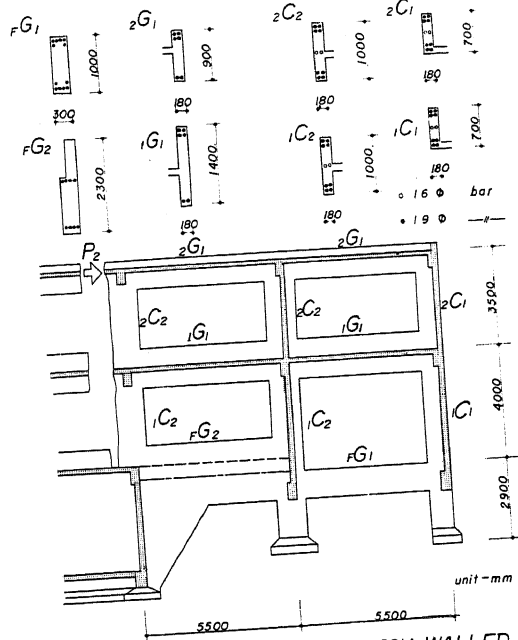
SKELETON OF HAMAMATSU WALLED FRAME (A PAIR OF FIG. 3 FRAME)
